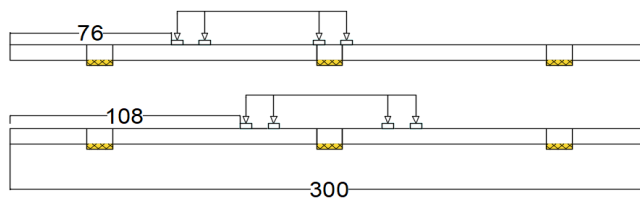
Location of P-15 truck for 9 ft girder spacing deck slab (2 cells, Case 1, unit: in)
